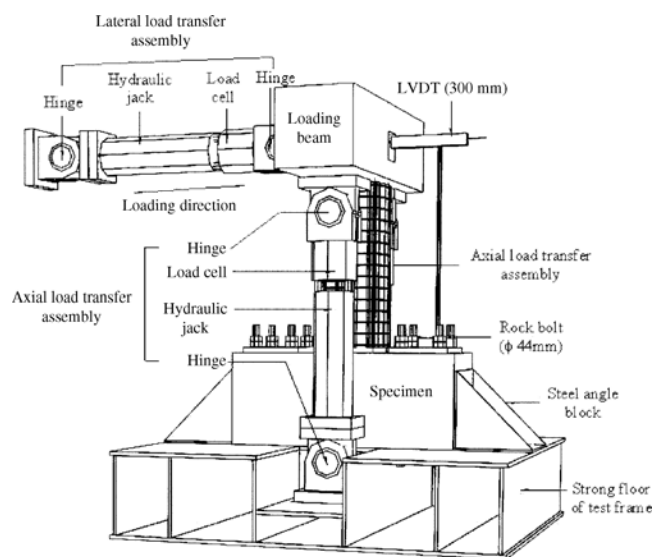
Test setup. (Note: 1 mm = 0.0394 in.)
